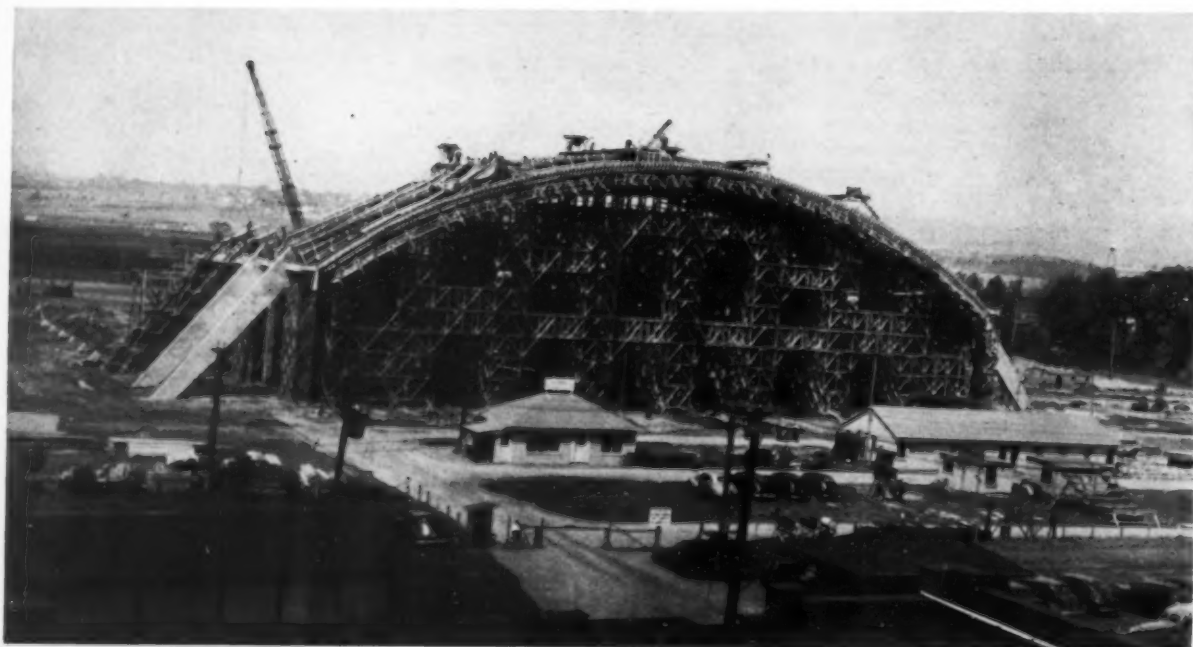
THIN-SHELL CONCRETE ARCH, designed to house Quebec's new hockey arena, spans 240 ft between A-frame buttresses. Curved roof slab varies from 4 to 6 in. in thickness. Rib spacing is 30 ft. Shell slab is cantilevered 15 ft on each side of 60-ft, two-rib pouring units.
